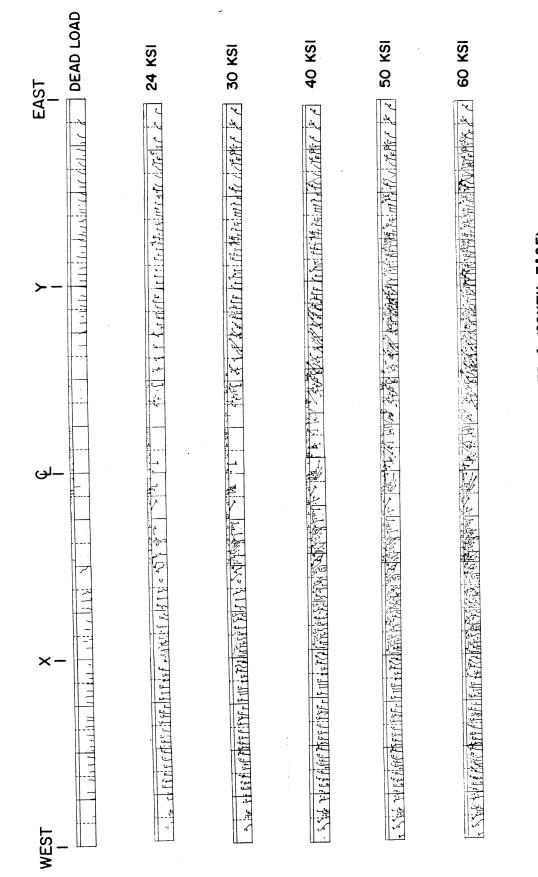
CRACK HISTORY FOR INNER GIRDER 1 (SOUTH FACE)
